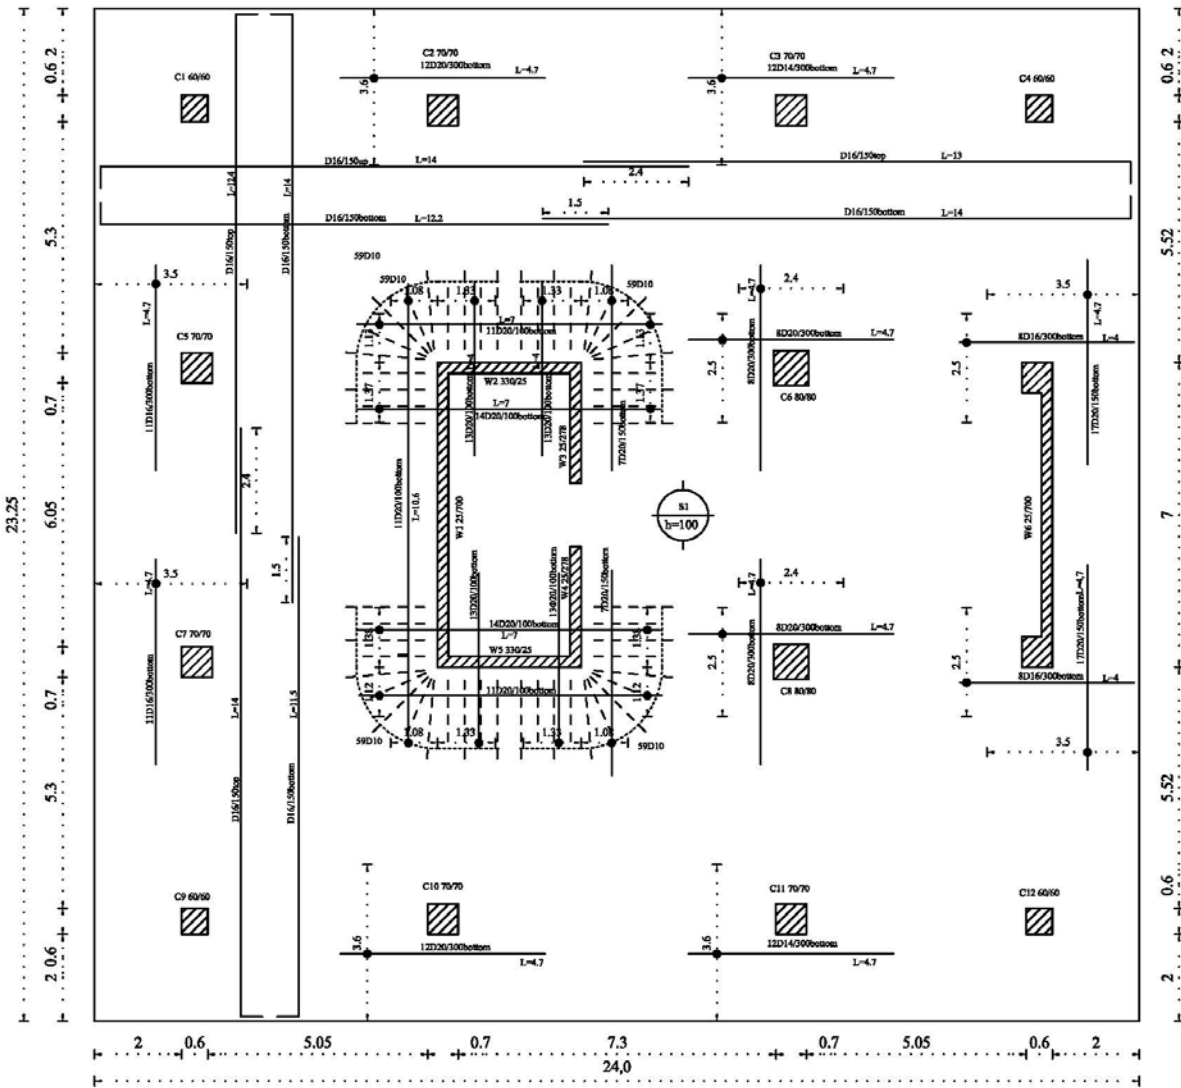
Reinforcement layout of the slab-on grade foundation
